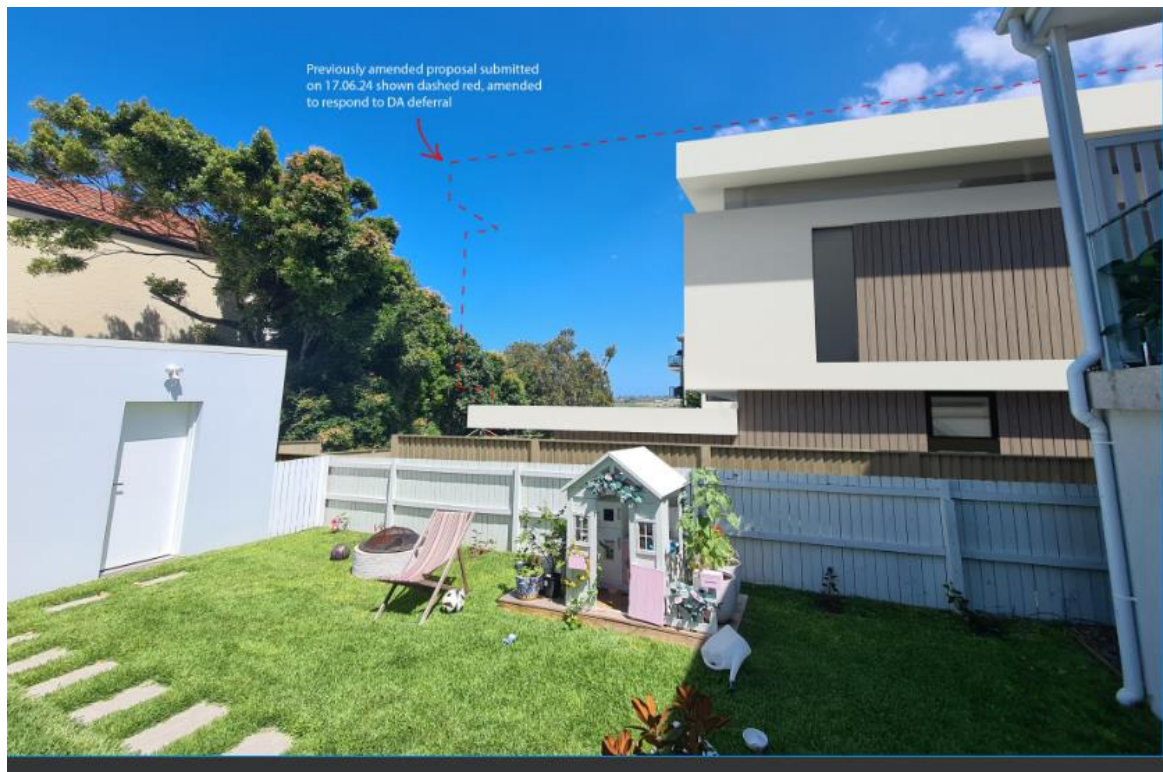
View from rear garden of 1 Bona Vista Avenue - Render demonstrating how the proposal will look (Source: Applicant)
